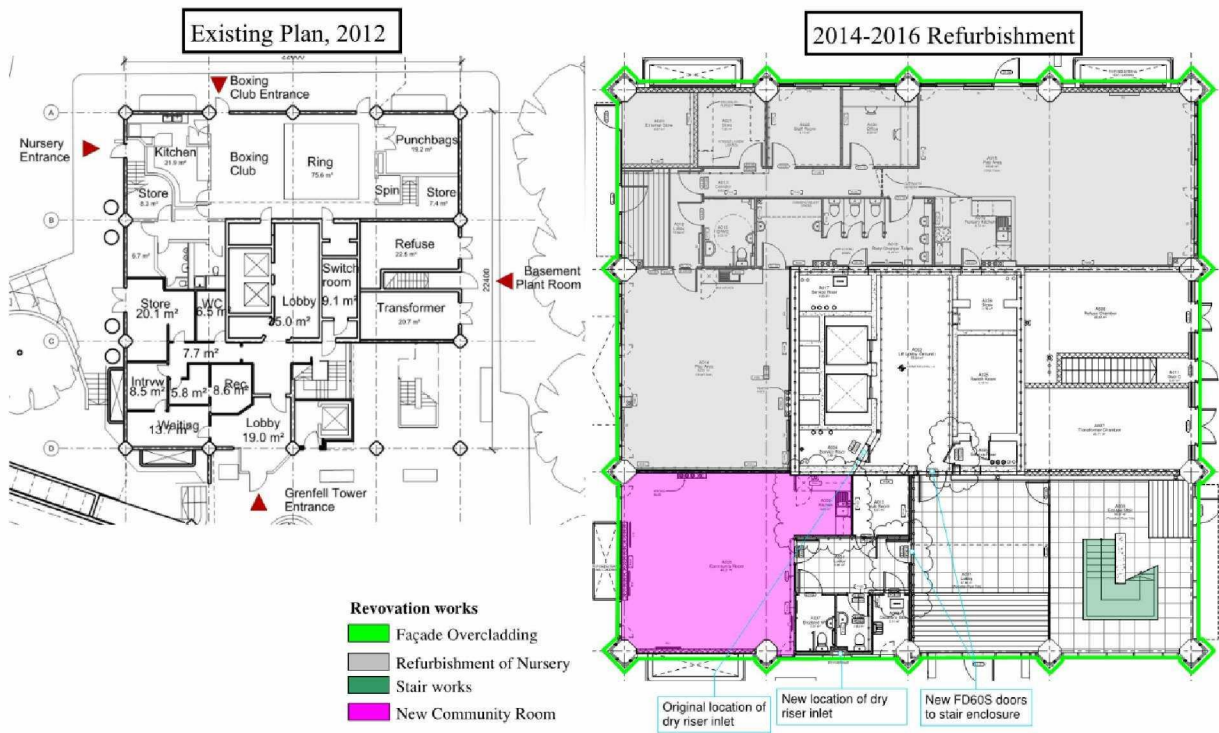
Ground level – refurbishment plan and existing 2012 plan (MAX00000879, SEA0003232)
